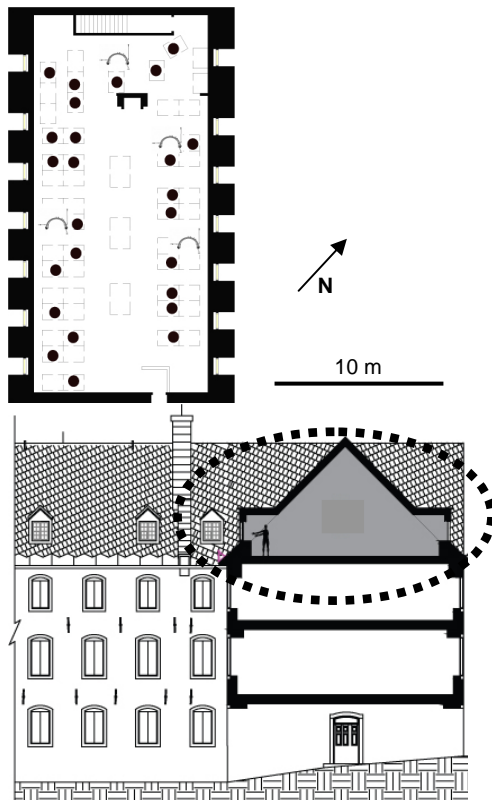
Classroom layout and longitudinal section. Classroom is in the attic.
